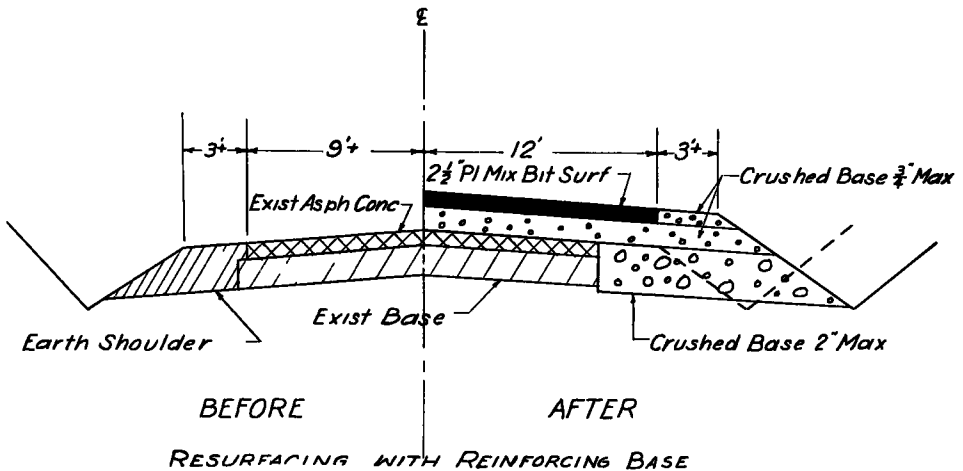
Widening and resurfacing asphaltic concrete pavement.
